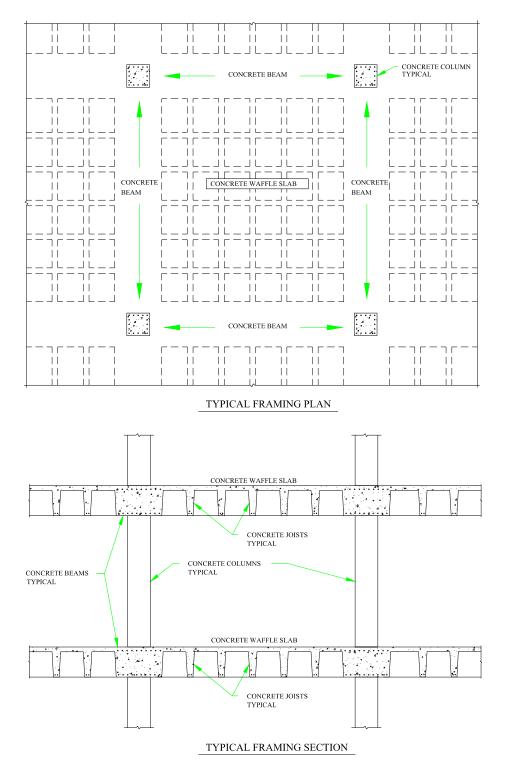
Typical Plan and Section of Concrete Waffle Slab in CSB 1
